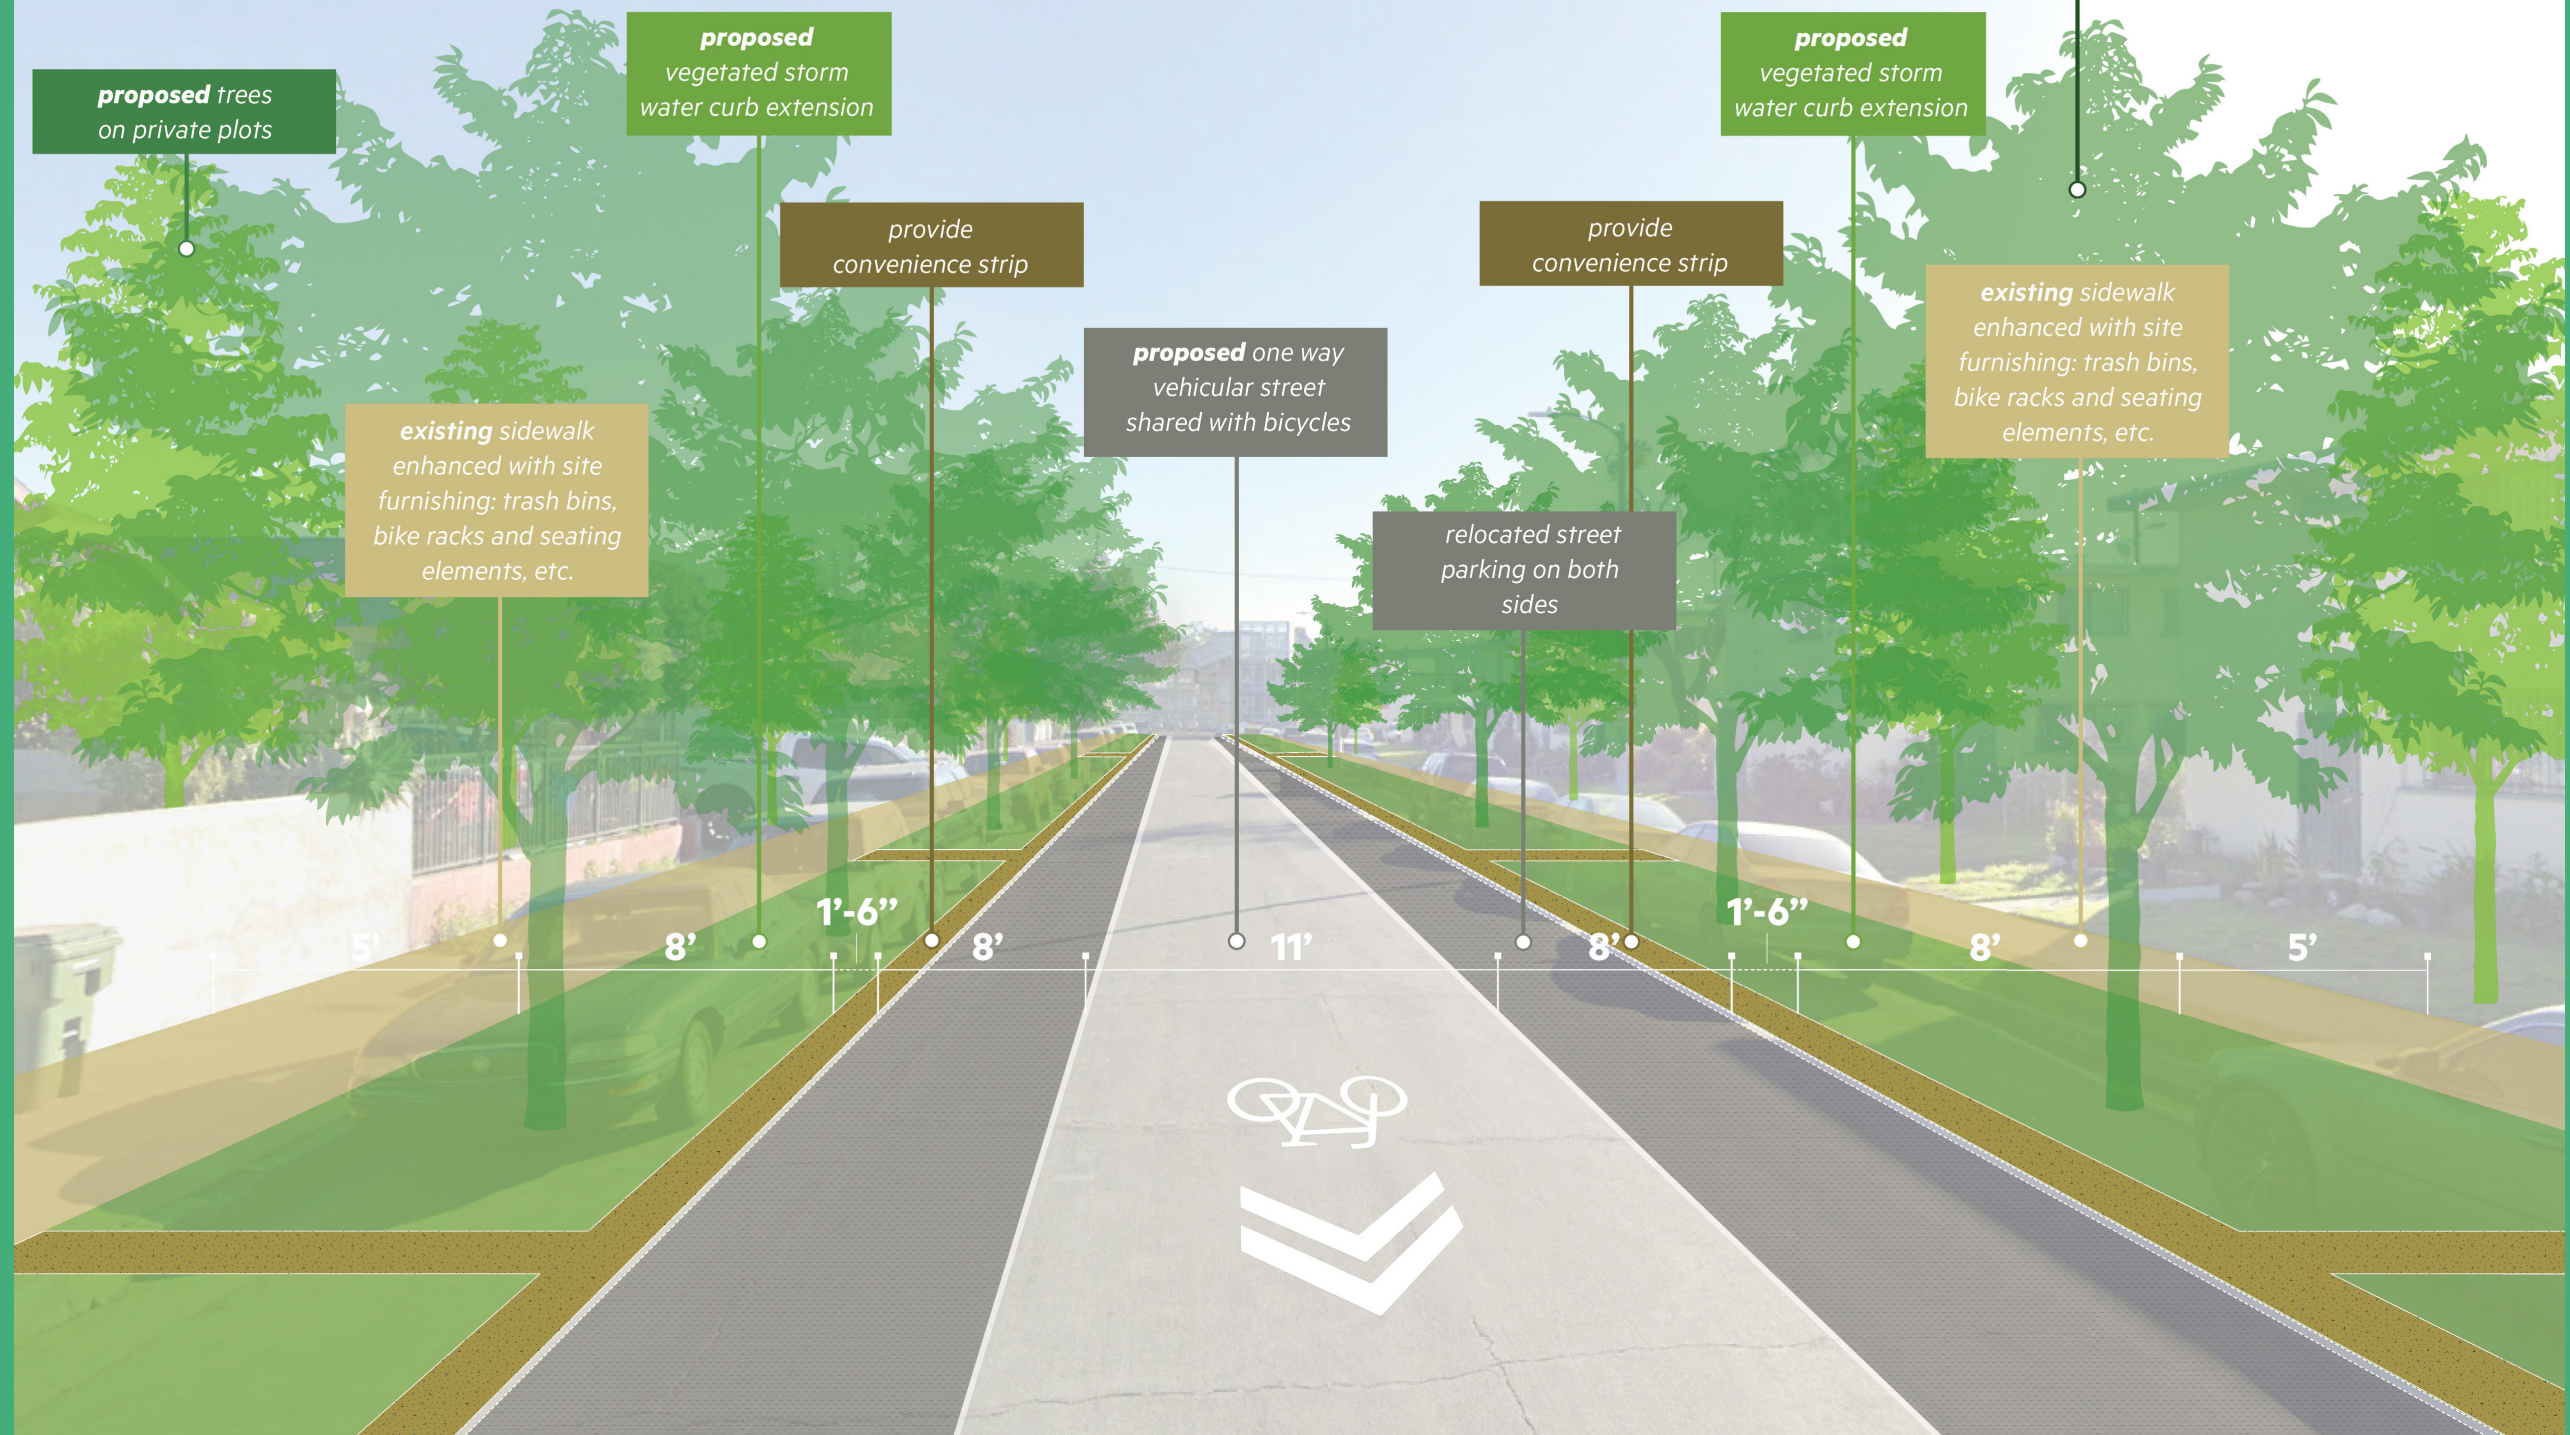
53rd Street and Long Beach Avenue, proposed design diagram, Tier 3
